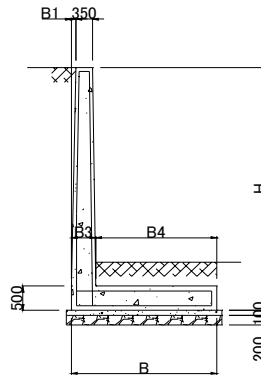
Typical Structural Detail for Leaning Type Retaining Wall
